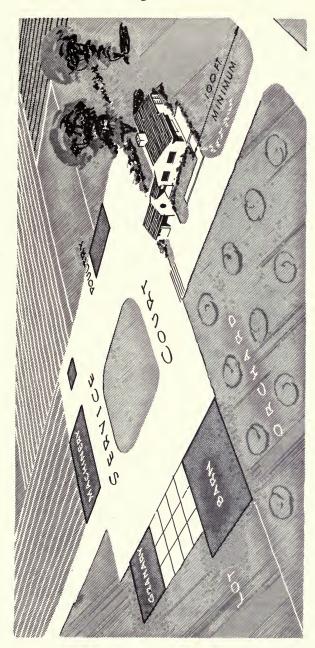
Plot layout of farmstead showing relation of house to the farm buildings.
